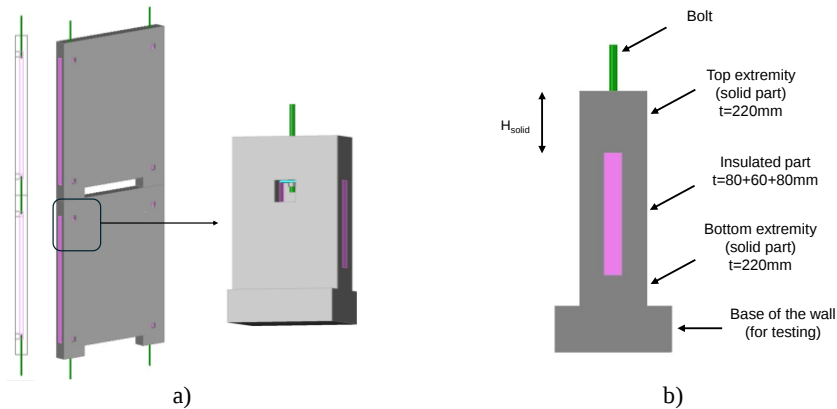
Load-bearing walls with bolted connections: (a) Representative single-connection specimen of the proposed structural system; (b) Profile view of the single connection specimen, highlighting common characteristics.
